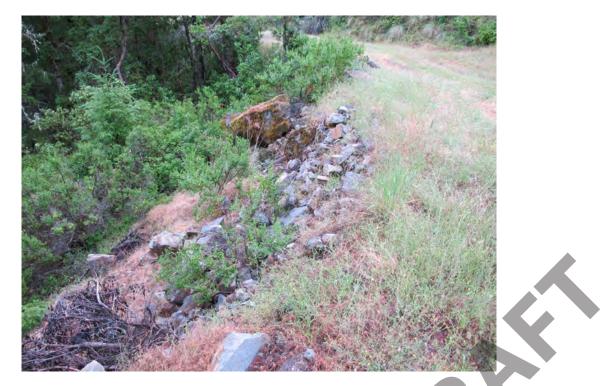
Looking east; angular crushed rock armoring 15' high fill on outboard slope, waterbar crossing road.
